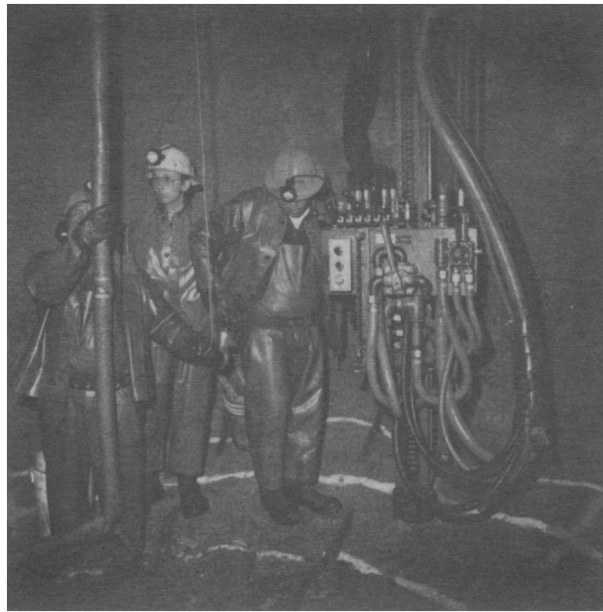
Crews are shown setting up one of the two single boom drill jumbos used to drill the full-face rounds. The jumbos improved drilling accuracy and vertical hole alignment.
